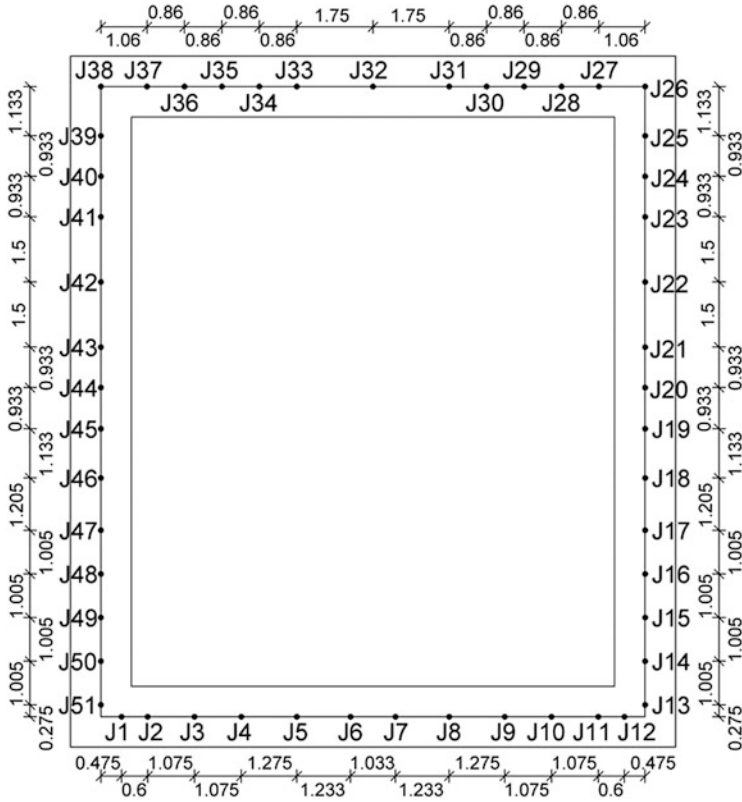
FE discretization grid of the strip foundation of the basement walls
